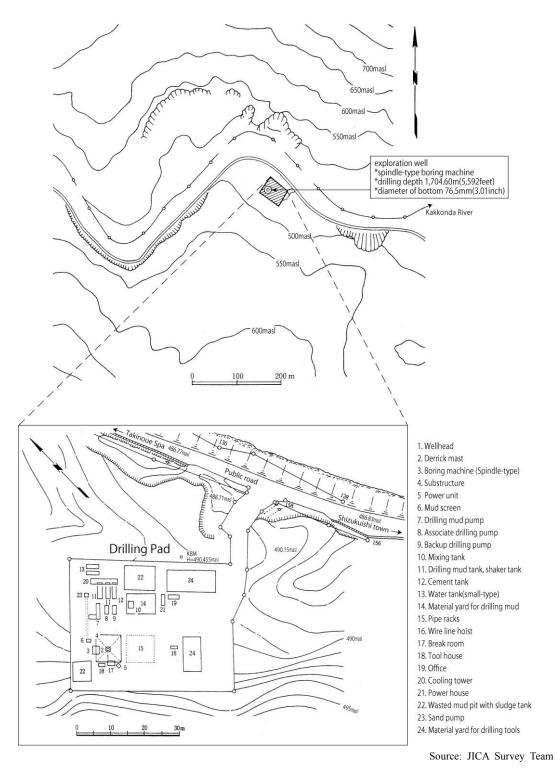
Drilling Site Layout Example in Case of Drilling with Spindle-Type Rig
